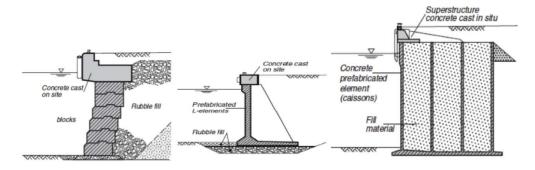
Gravity wall structures: block wall, L-wall, and caisson wall (De Gijt & Broeken, 2013)
